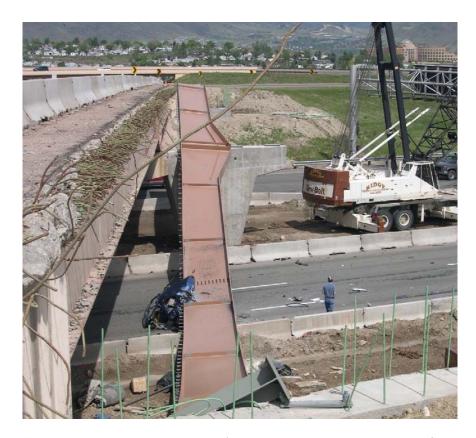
Fallen girder and top portion of the accident vehicle on I-70 (looking north). The C-470 bridge/overpass being widened is to the left of the fallen girder in this photograph.
